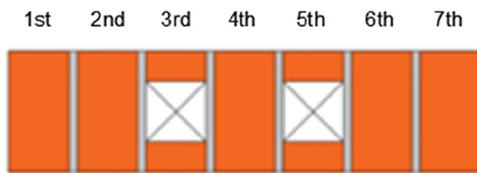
Illustration about the masonry wall, horizontal view (voids are marked with X)
